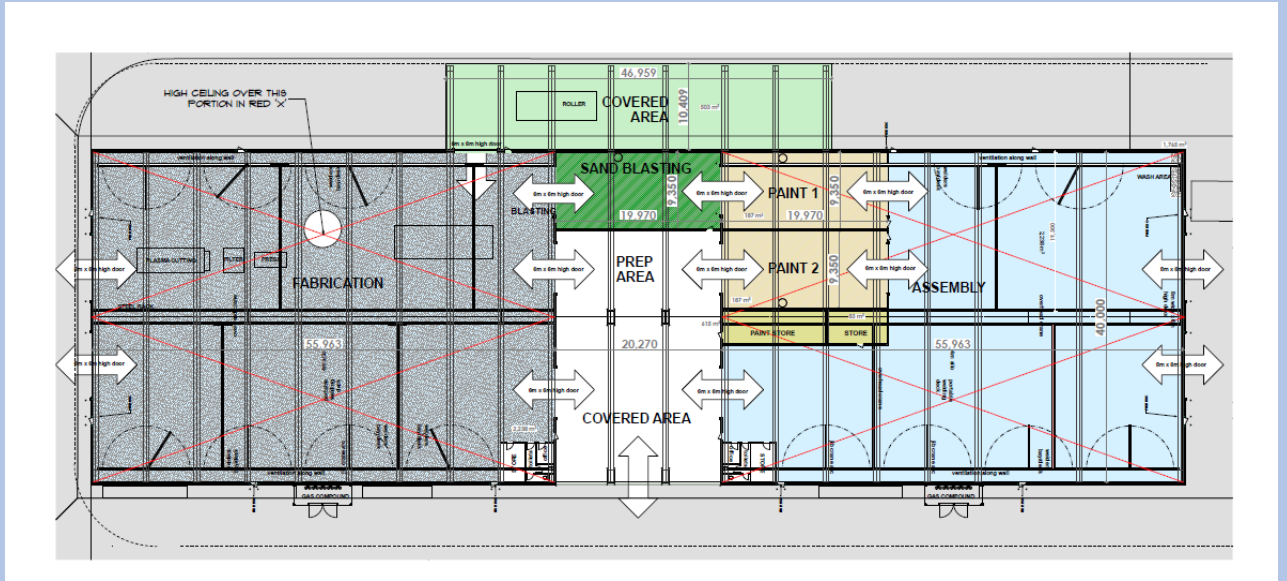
Zone 2 & 3. Factory Plan (Image not to scale).
